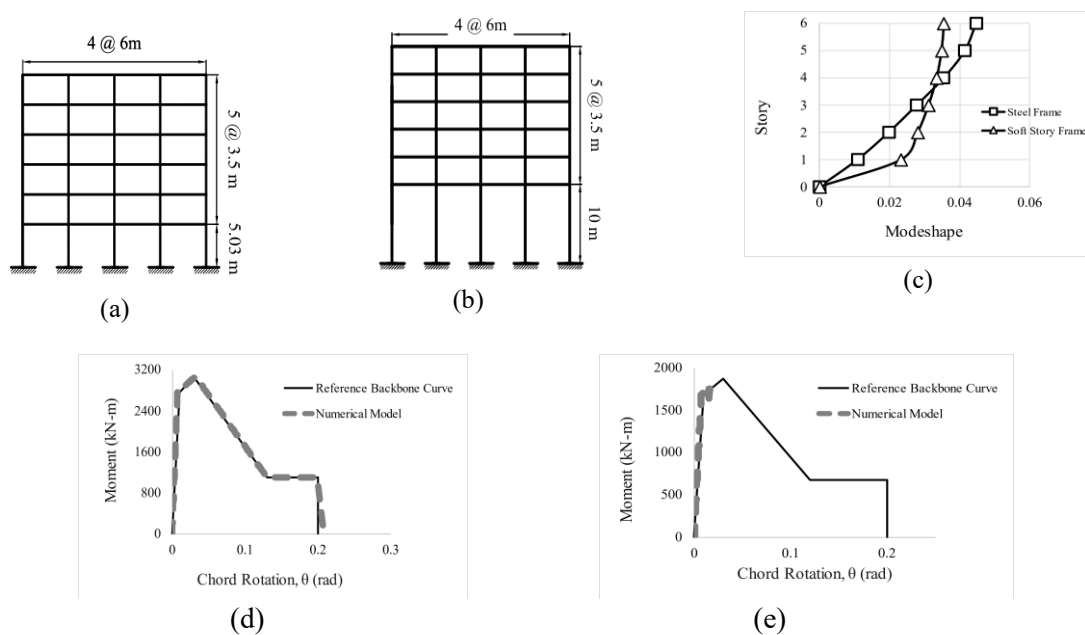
(a) Steel frame, (b) Soft story steel frame, (c) First mode shape of the frames; Pushover moment-rotation response at exterior joints of (d) W 24X146 beam between 1st and 2nd story, (e) W 24X94 beam between 4th and 5th story
